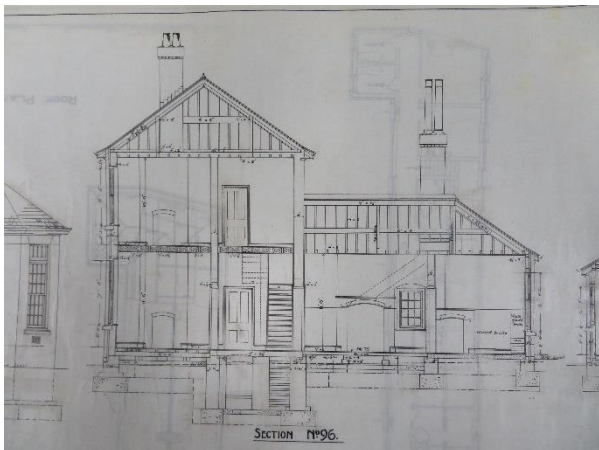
& 14, Section drawings showing cut roof construction (Skinner, 2019)
